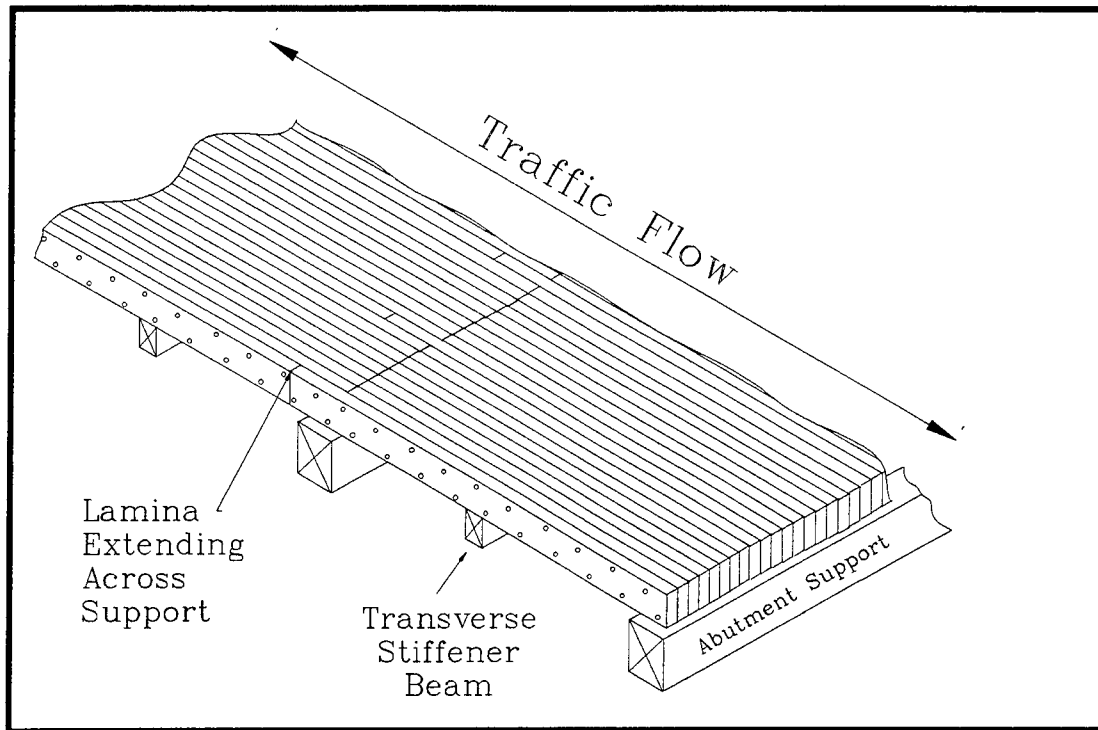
Simple Span Longitudinal Nail-Laminated Timber Deck
